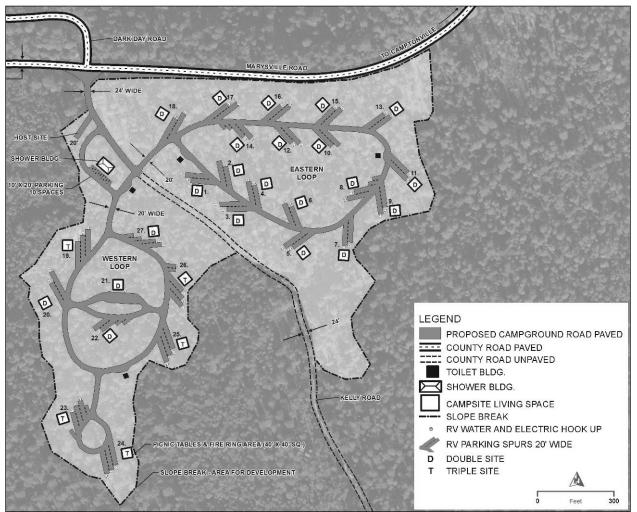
Conceptual layout for Kelly Ridge Campground.
